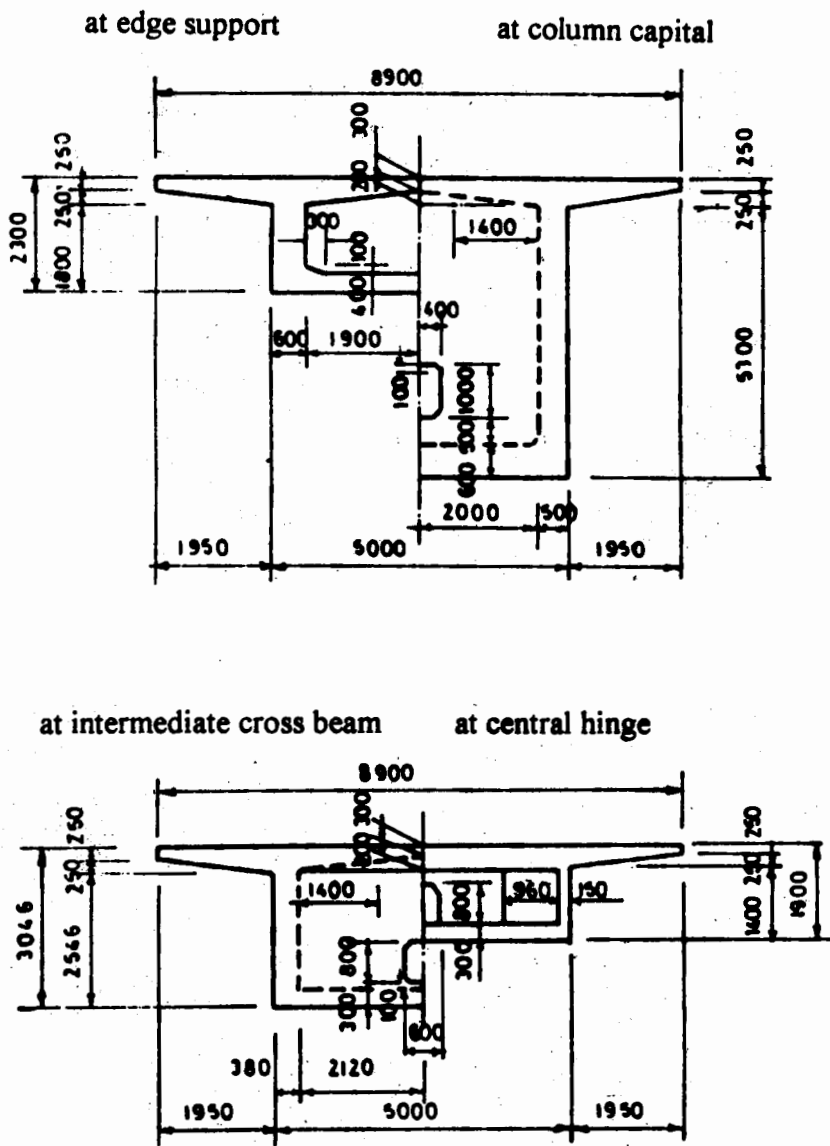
Typical Cross-section of Meghna-Gumti Bridge (All Dimensions in mm)
